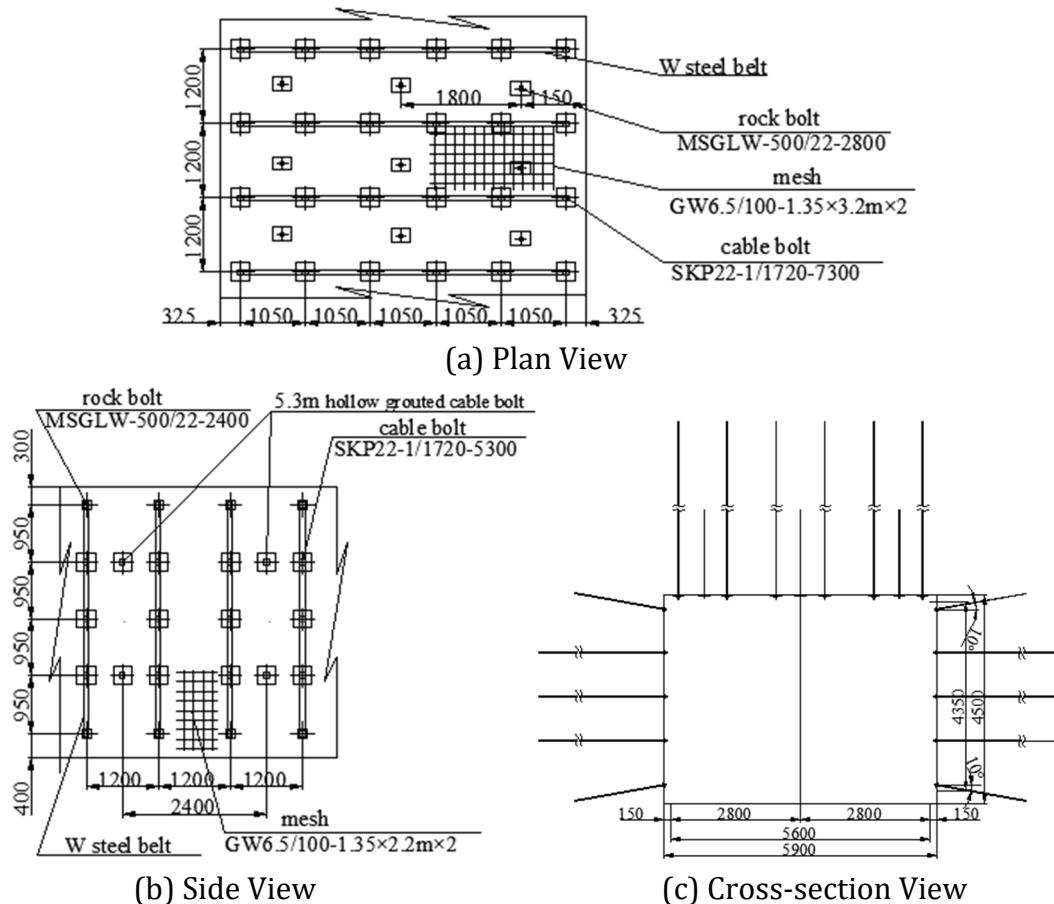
Reinforced Support Design of the 2103 Panel Auxiliary Transportation Roadway (West) Using Grouting cable bolts
